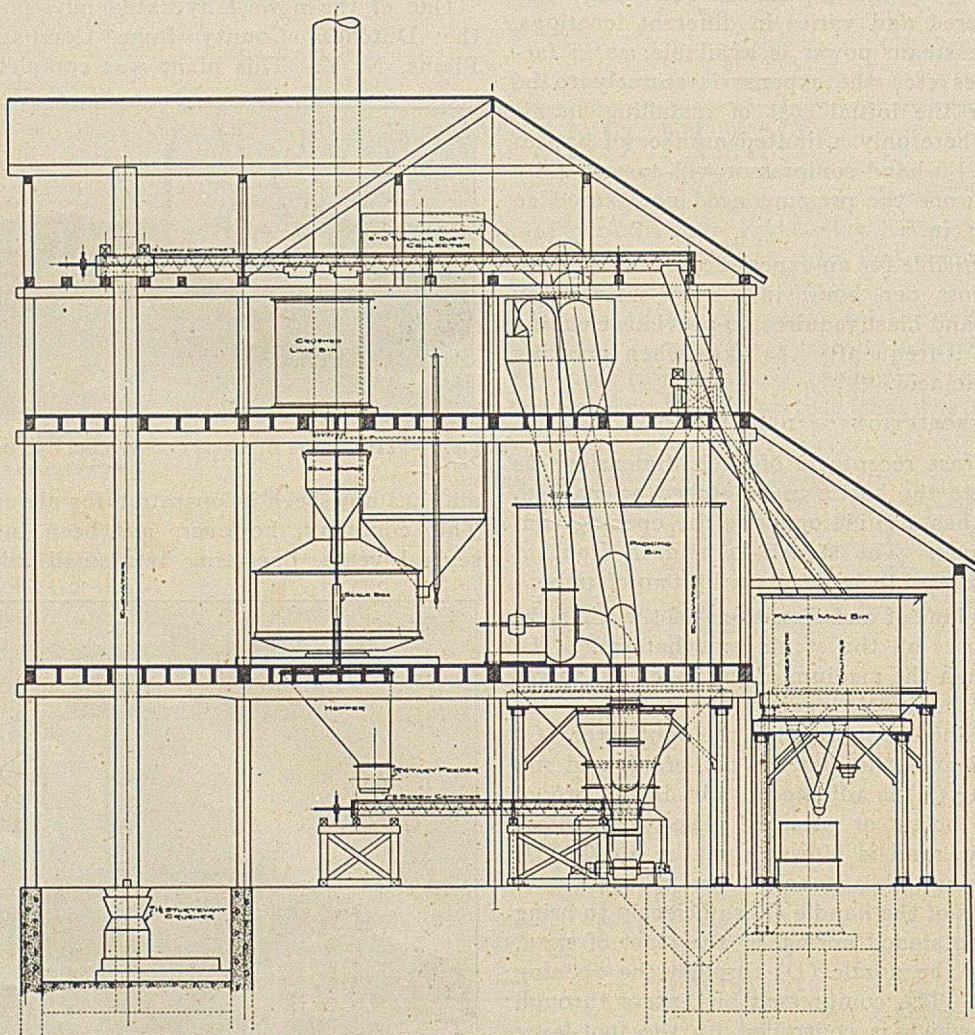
SIDE ELEVATION, HYDRATING PLANT, DUTCHESS COUNTY LIME CO.
